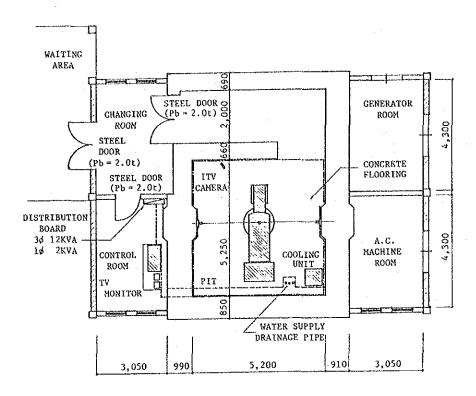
LINEAR-ACCELERATOR INSTALLATION PLAN
